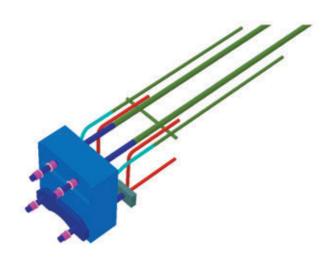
The KS14 unit SOLIDO model (surrounding construction omitted for clarity)
